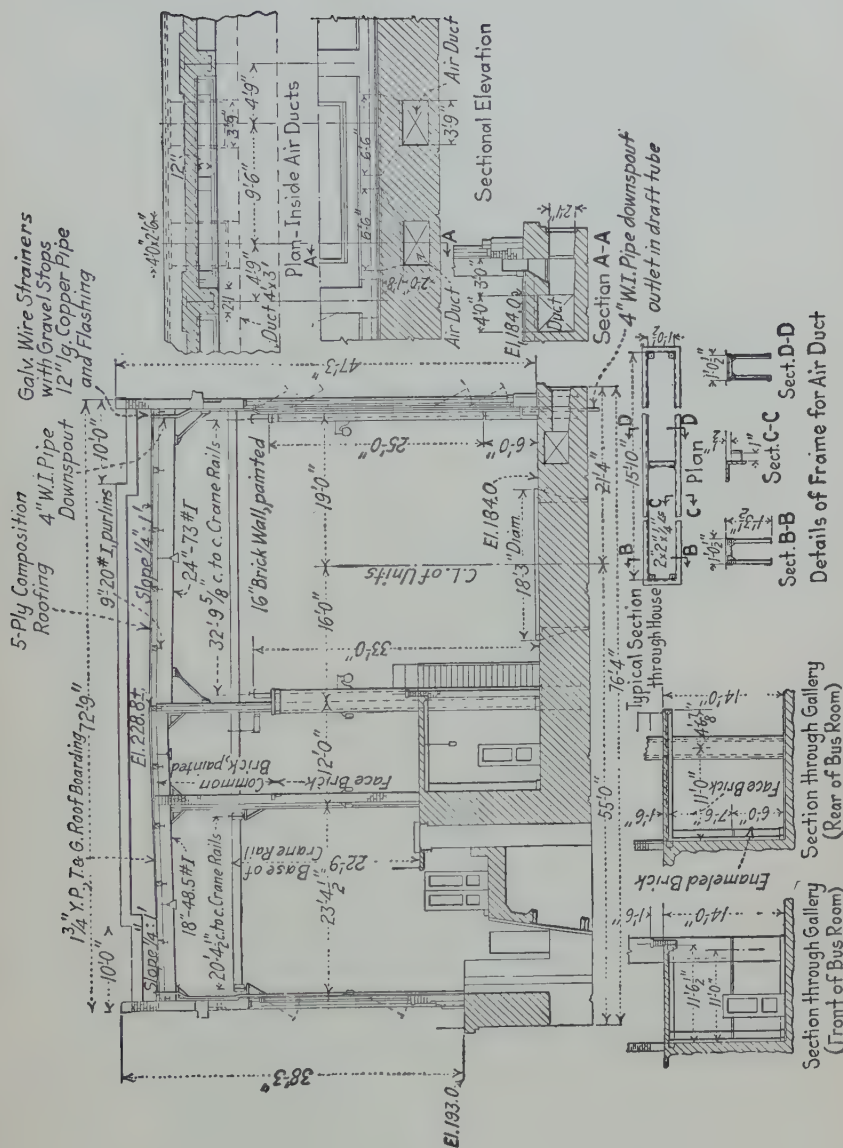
Crescent power house superstructure, cross section—State of New York, canal system.
